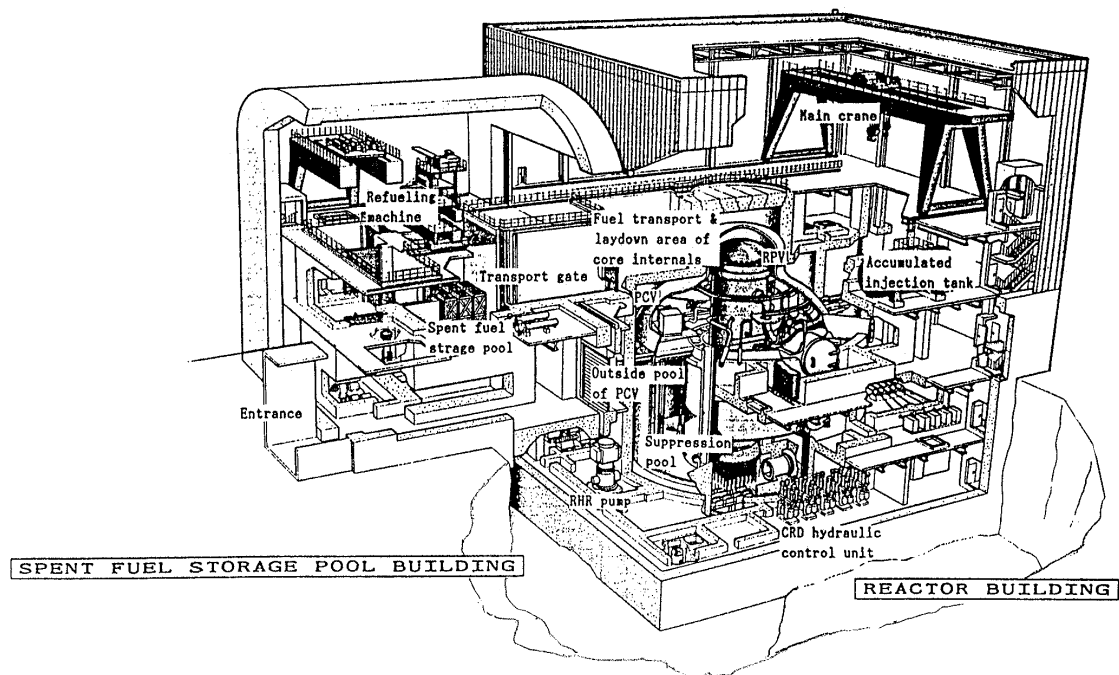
General layout arrangement of the HSBWR reactor.
